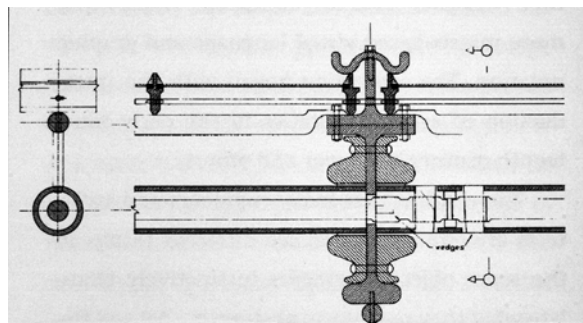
Structural detail of the Palm House at Kew Gardens, London. Richard Turner, 1848.
